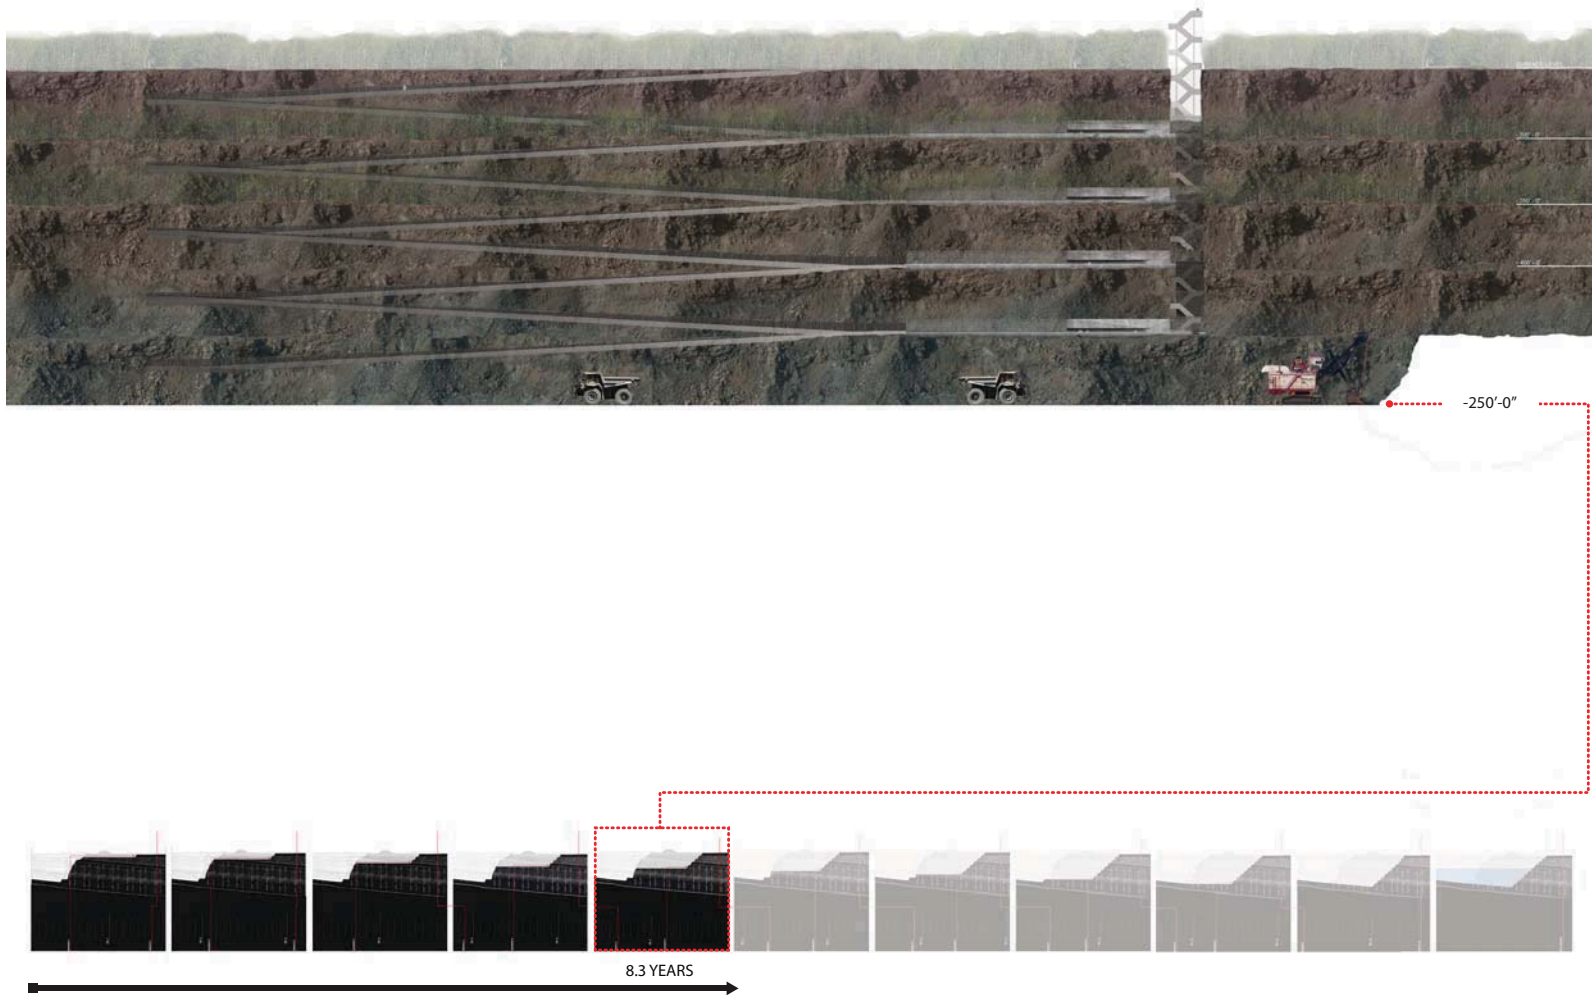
Elevation and Section of Site Change Sequence, Bench 5.
